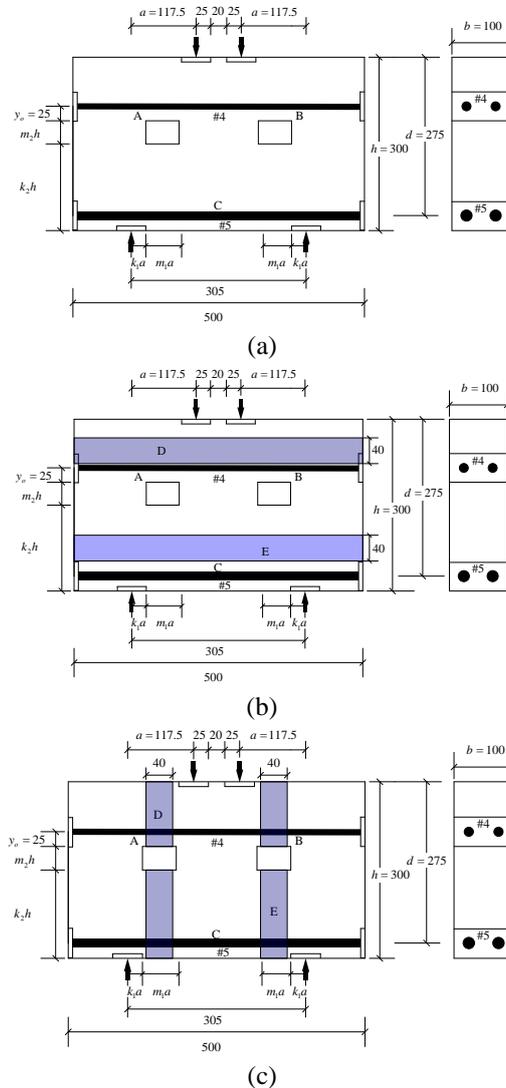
Typical specimen; (a) Not strengthened (b) Strengthened with CFRP in the horizontal direction (c) Strengthened with CFRP in the vertical direction
